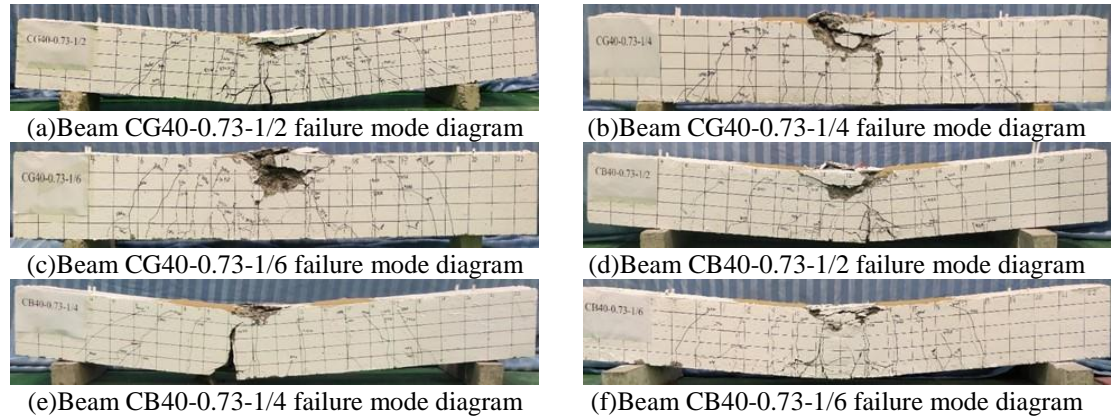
Failure mode diagram of High modulus HFRP concrete beam
